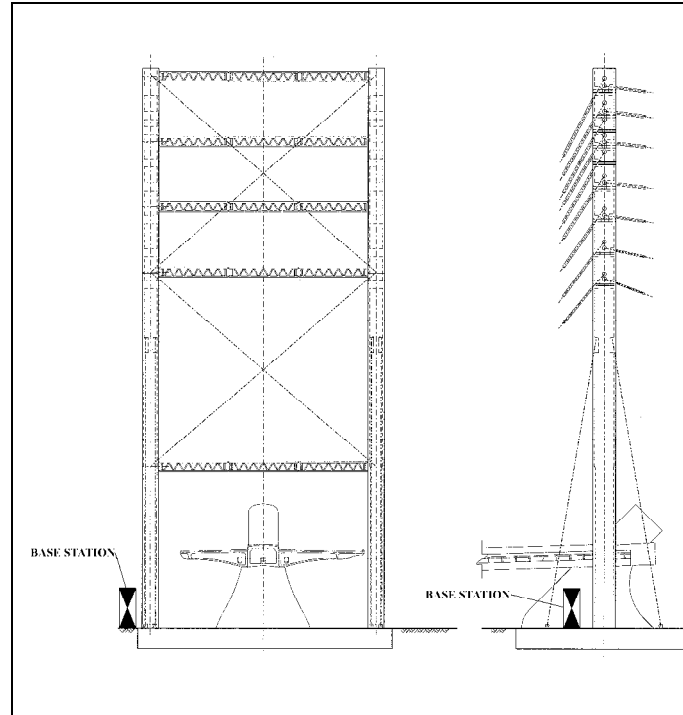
Base Station Location (Modified IRIB Specifications and Construction Plans)
